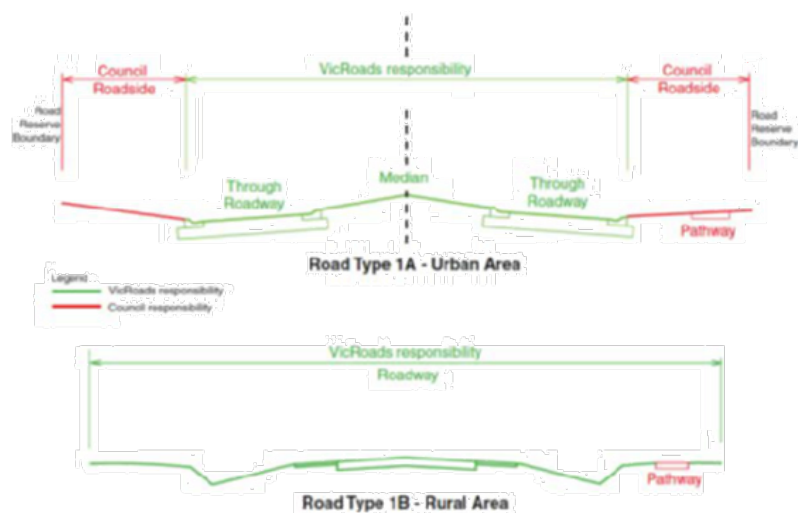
Demarcation Arrangements for Typical Rural Arterial Roads
